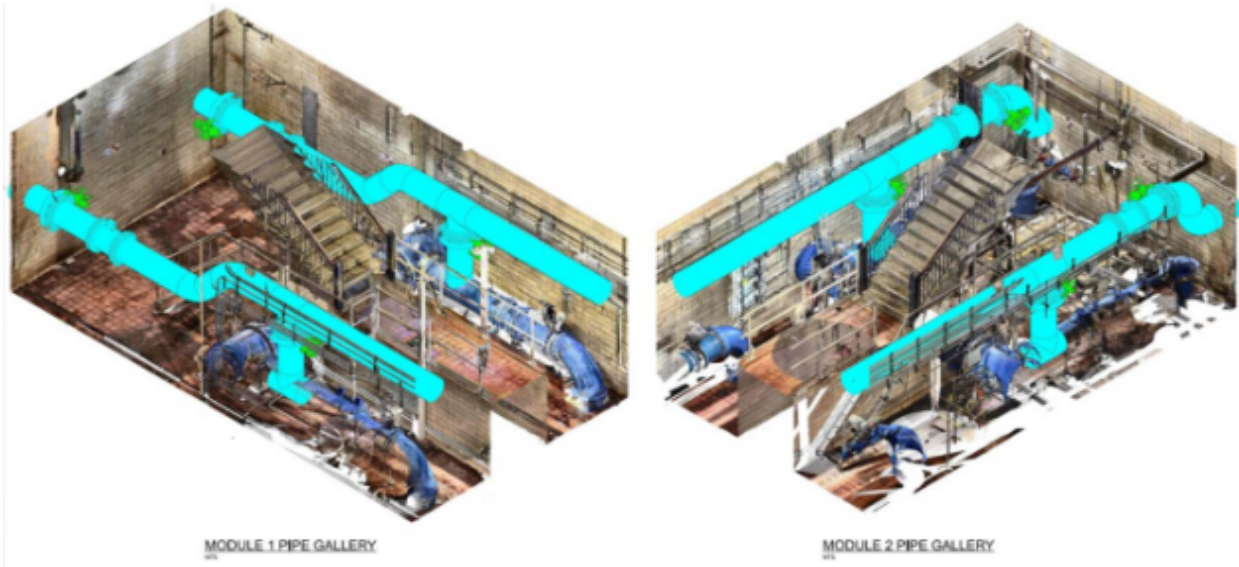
FTW Piping Conceptual Design (Source: CH2M Filter-to-Waste report, 2021)
